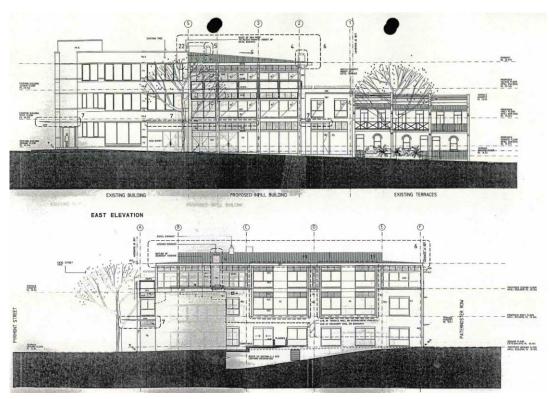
2000 – East and north elevations, prepared by Allen Jack + Cottier, architects, as part of the Section 96 application, dated 7 April 2000 (Source: City of Sydney Archives, D1999/00812, 'Development Applications/26-32/Pyrmont Bridge Road/Pyrmont/Alterations & Additions to Existing Building – Bulawayo Holdings Pty Ltd – 14 10 99 - \$5000000')
